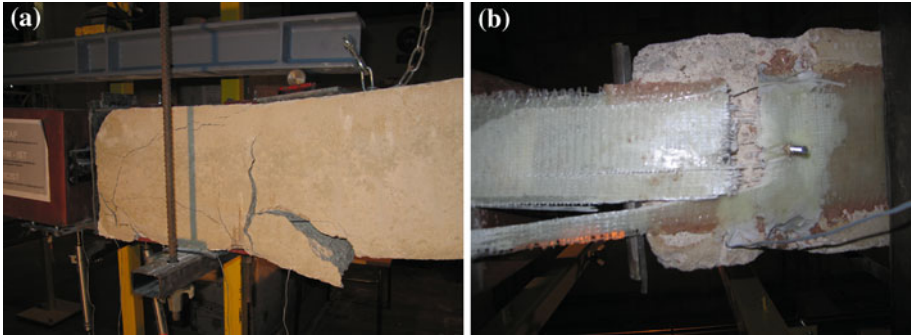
(a) Flexural failure of the masonry block near the cross section where reinforcement was interrupted (P_2 failure); (b) GFRP cut on the first innermost anchoring plate (view after dismantling the anchorage system) (A_1 failure)
